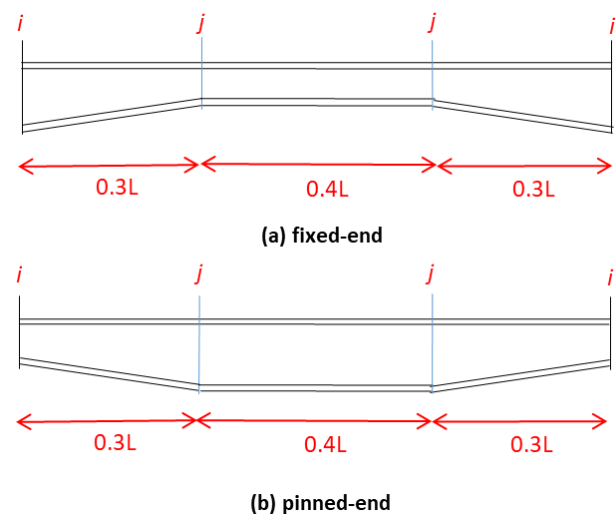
Tapered built-up beam configuration for the pre-engineered steel beam.
